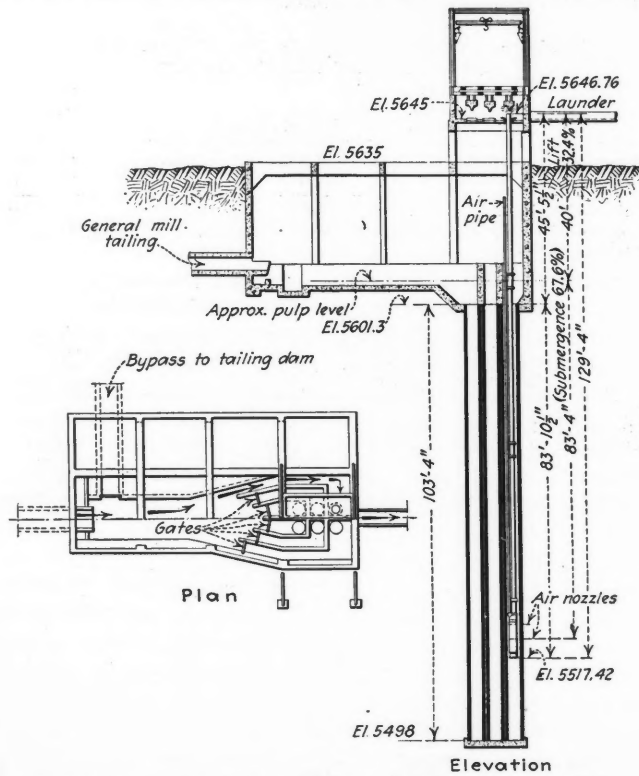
GENERAL ARRANGEMENT OF TAILING AIR-LIFT PLANT
